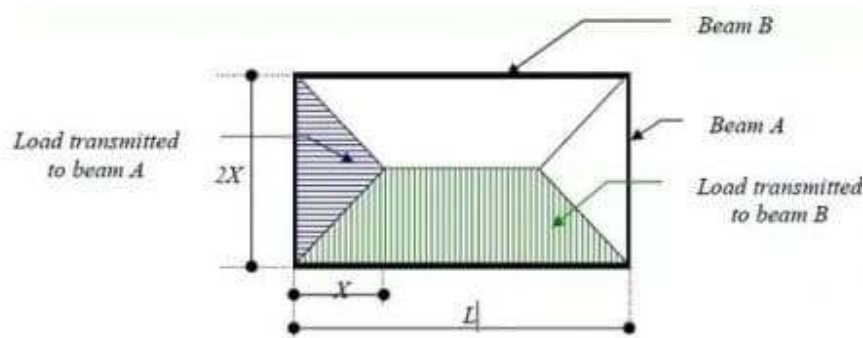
Load distribution mechanism from slab to beams or other supporting elements
